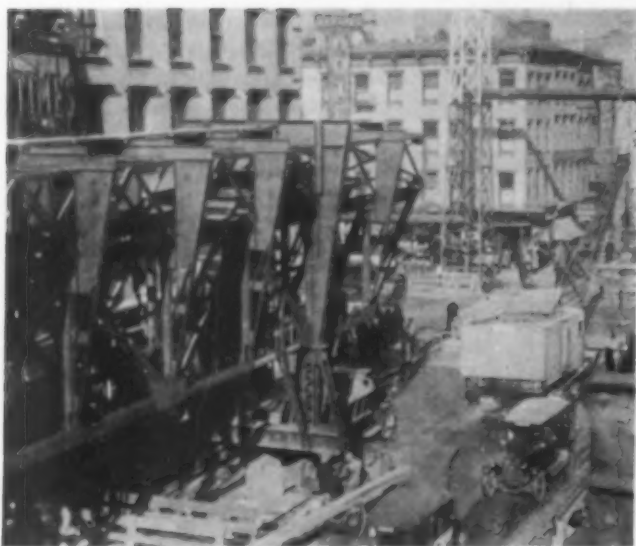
TYPICAL EXAMPLE OF BUILDING UNDERPINNING
